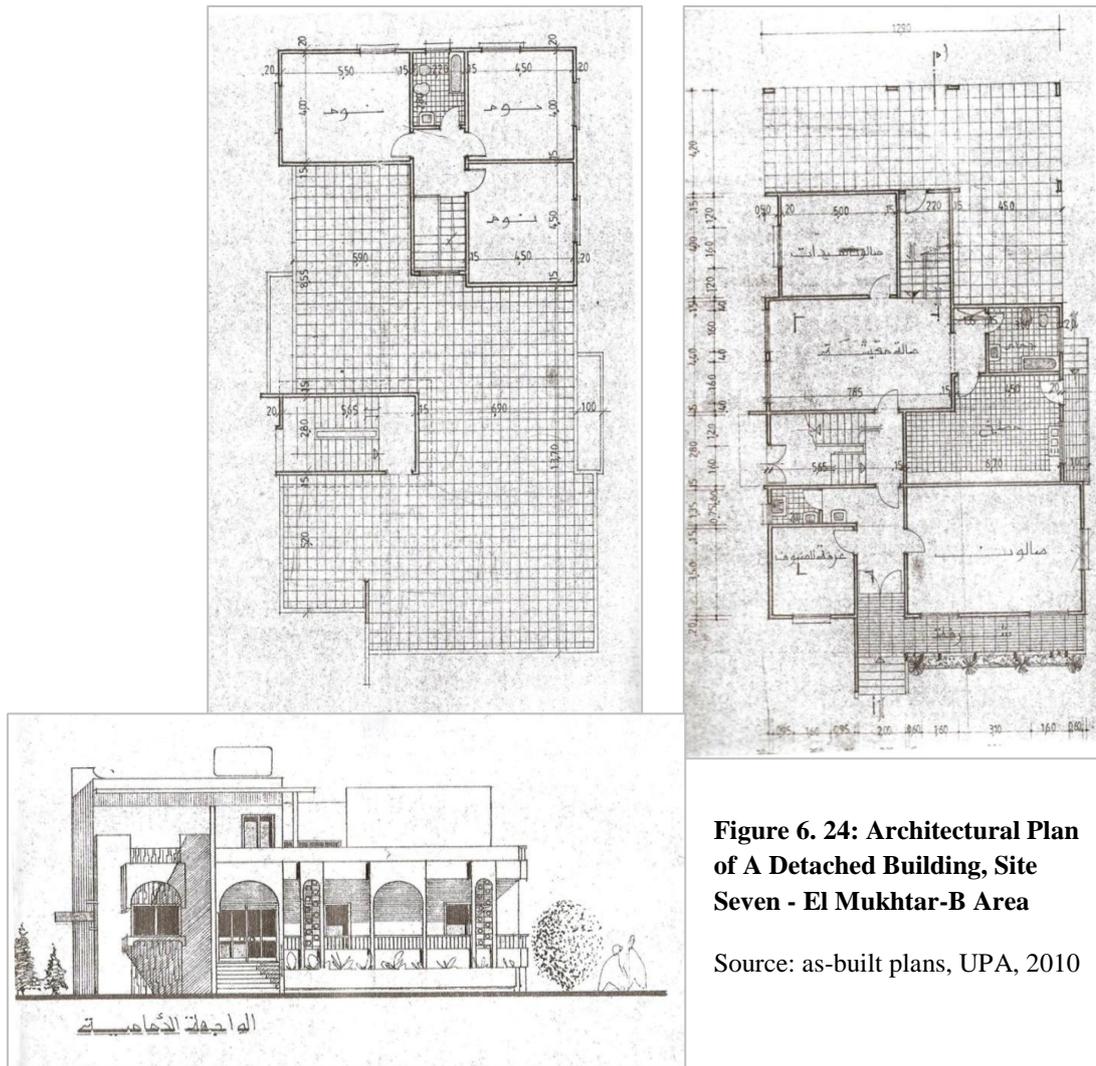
24: Architectural Plan of A Detached Building, Site Seven - El Mukhtar-B Area
